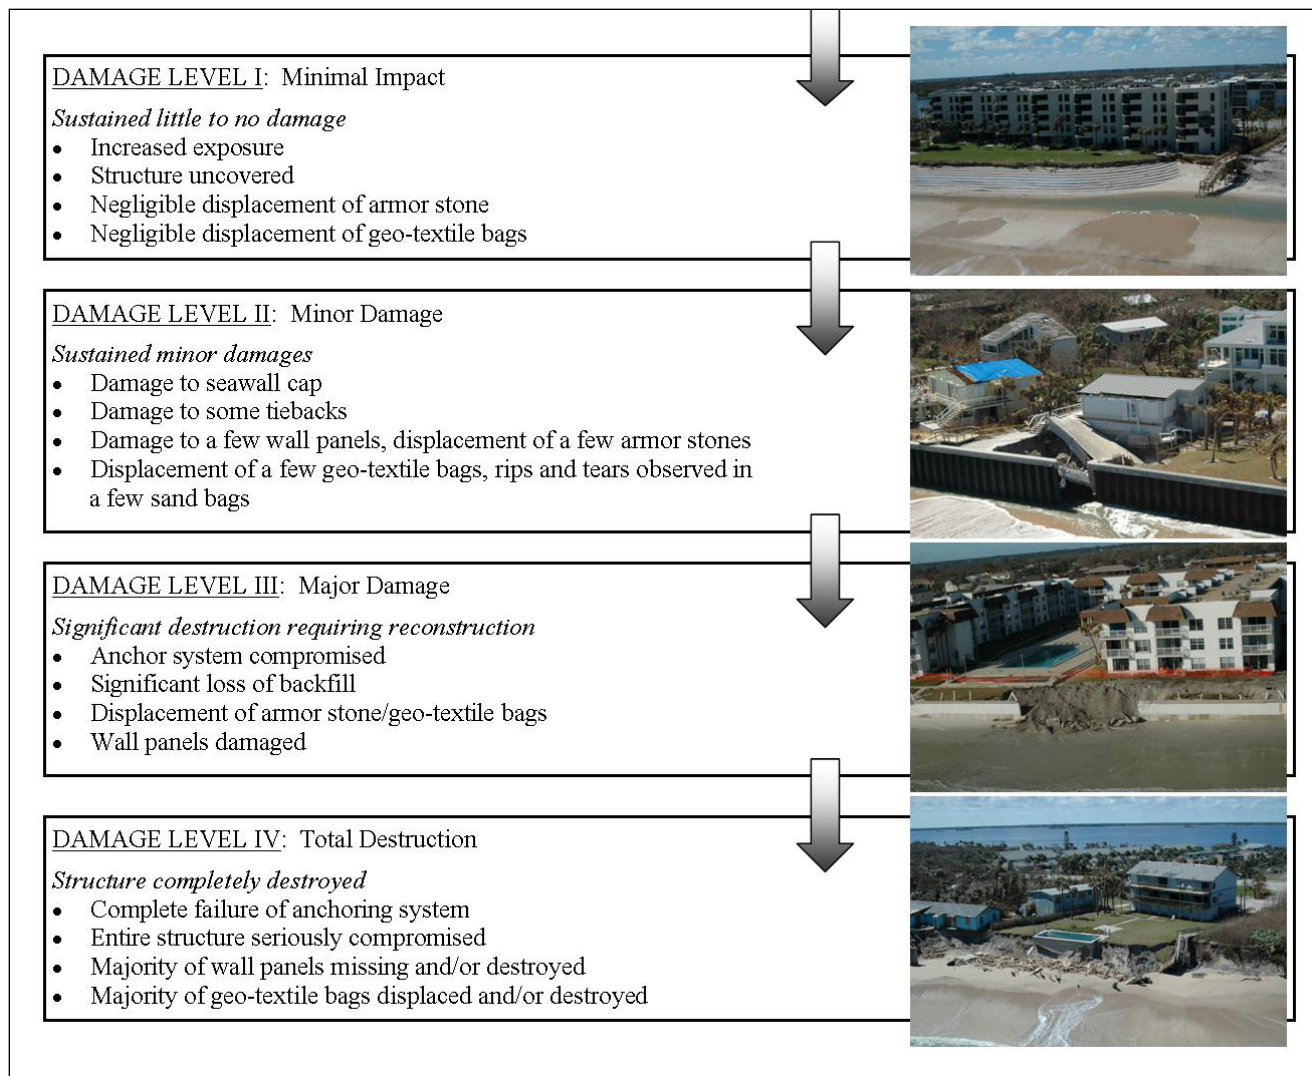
Levels of damage to coastal and shore protection structures (seawalls, bulkheads, revetments, groins, breakwaters, etc.)
